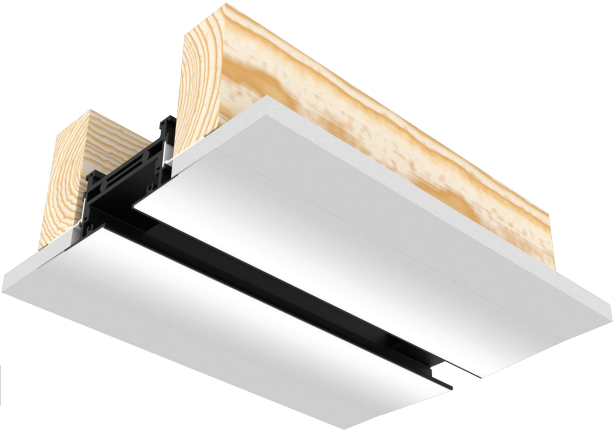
(Step 5A): Install Drywall – Tape and Spackle Border (C)
